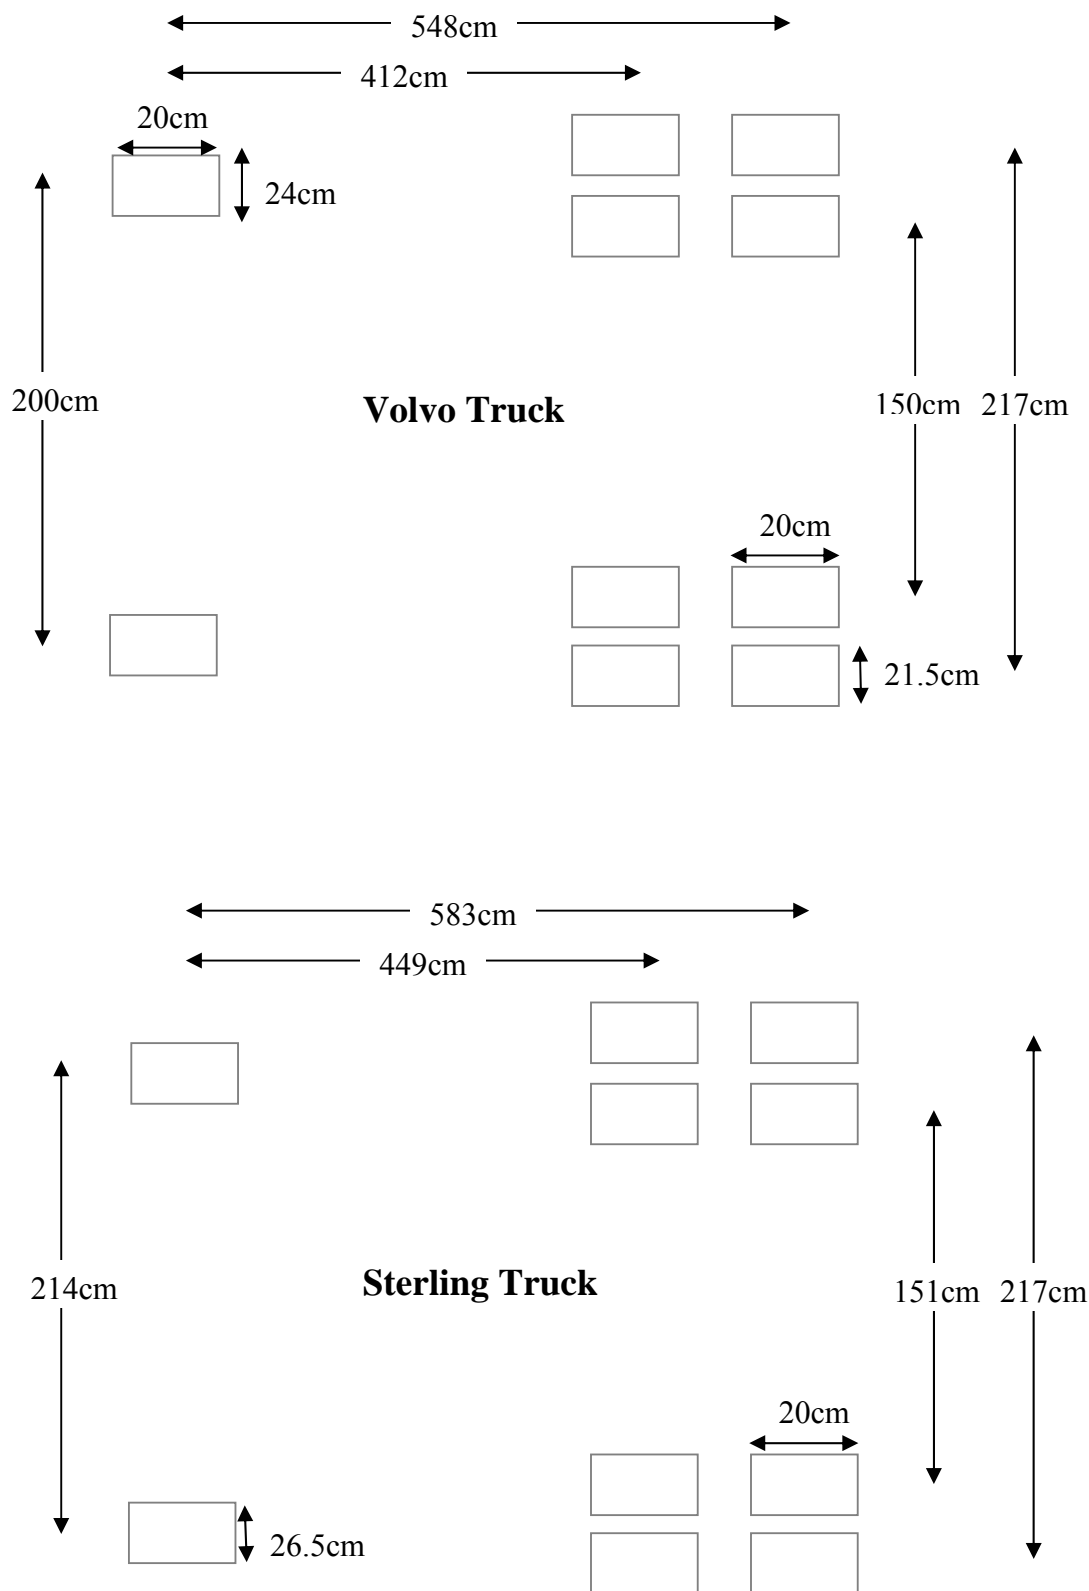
Dimensions of 3-Axle Dump Trucks Used during Live Load Tests.
